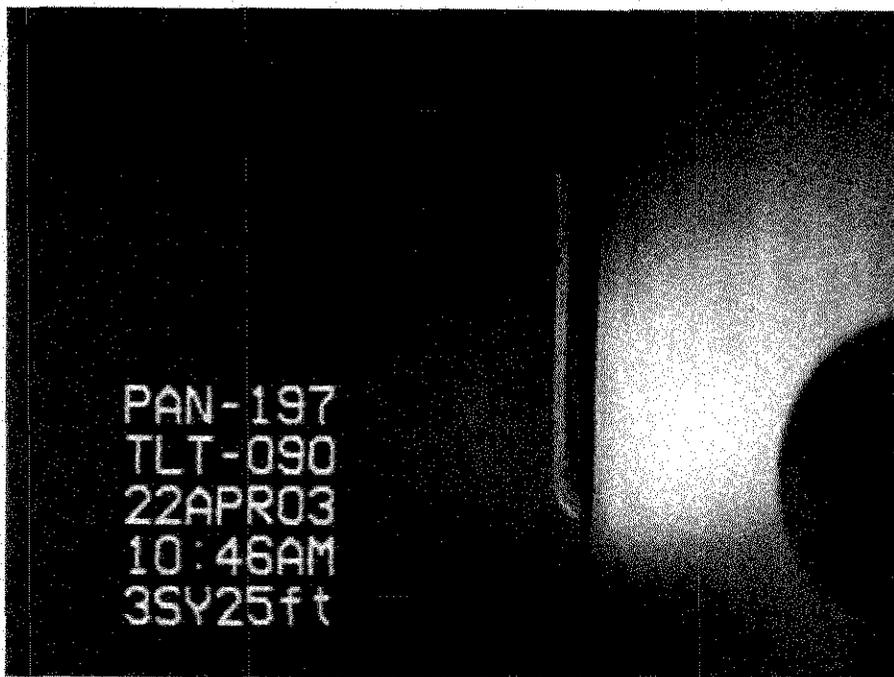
SY-103 Riser 43, Secondary Tank Wall (Left, 2003)
